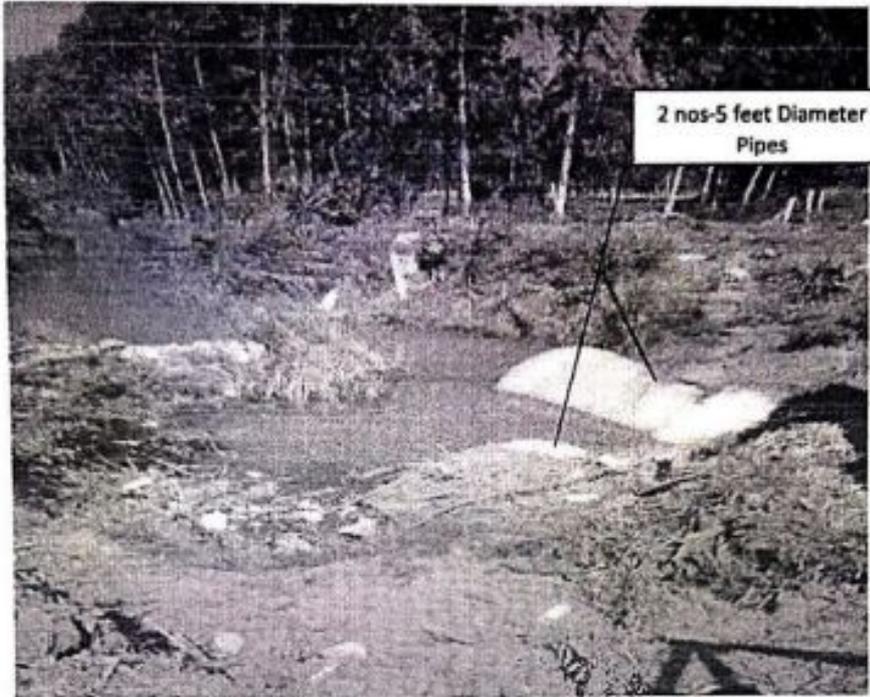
Two pipes of 5 feet Diameter provided at crossing point B'
